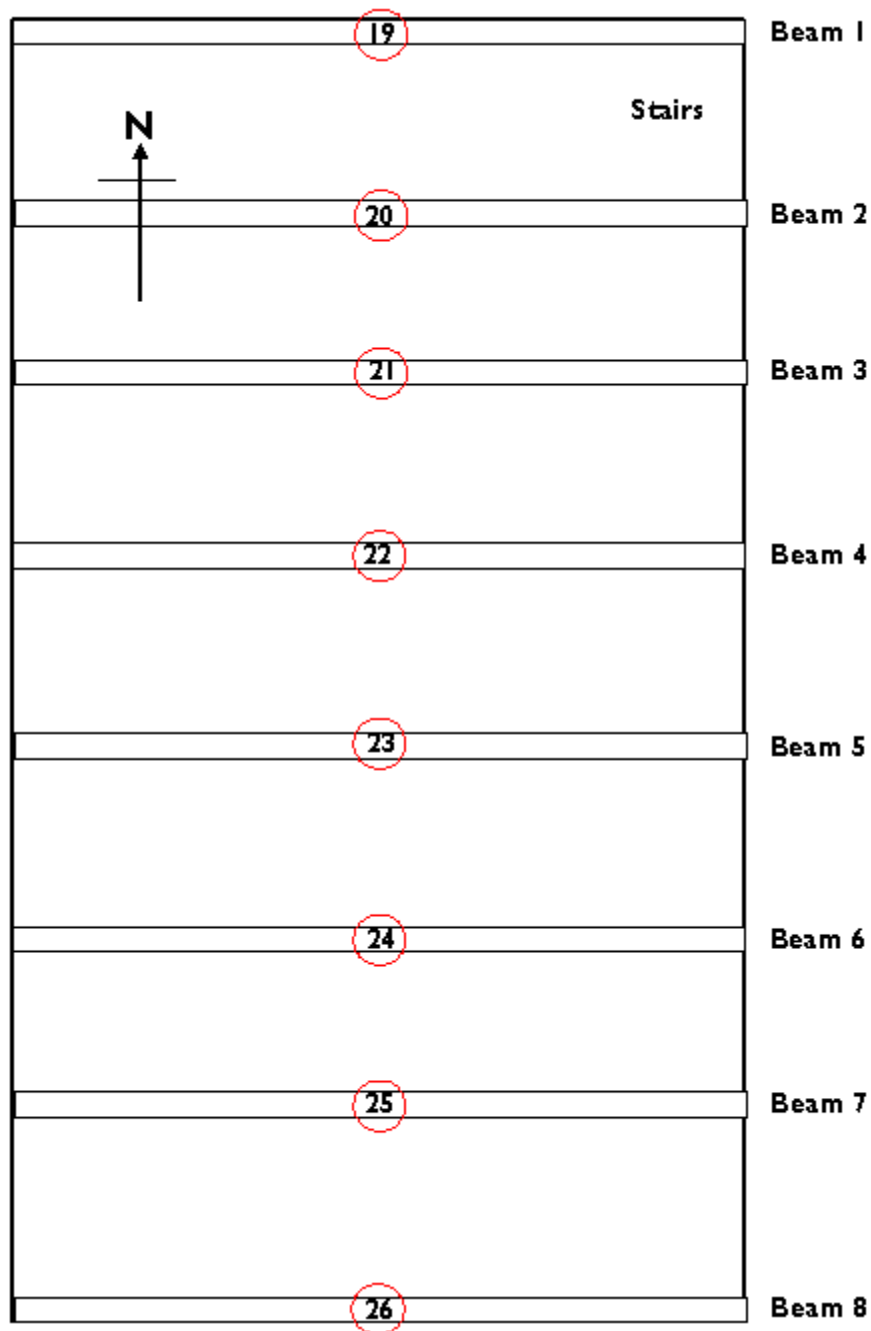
Plan of the Parvise roof to show position of sampled timbers
